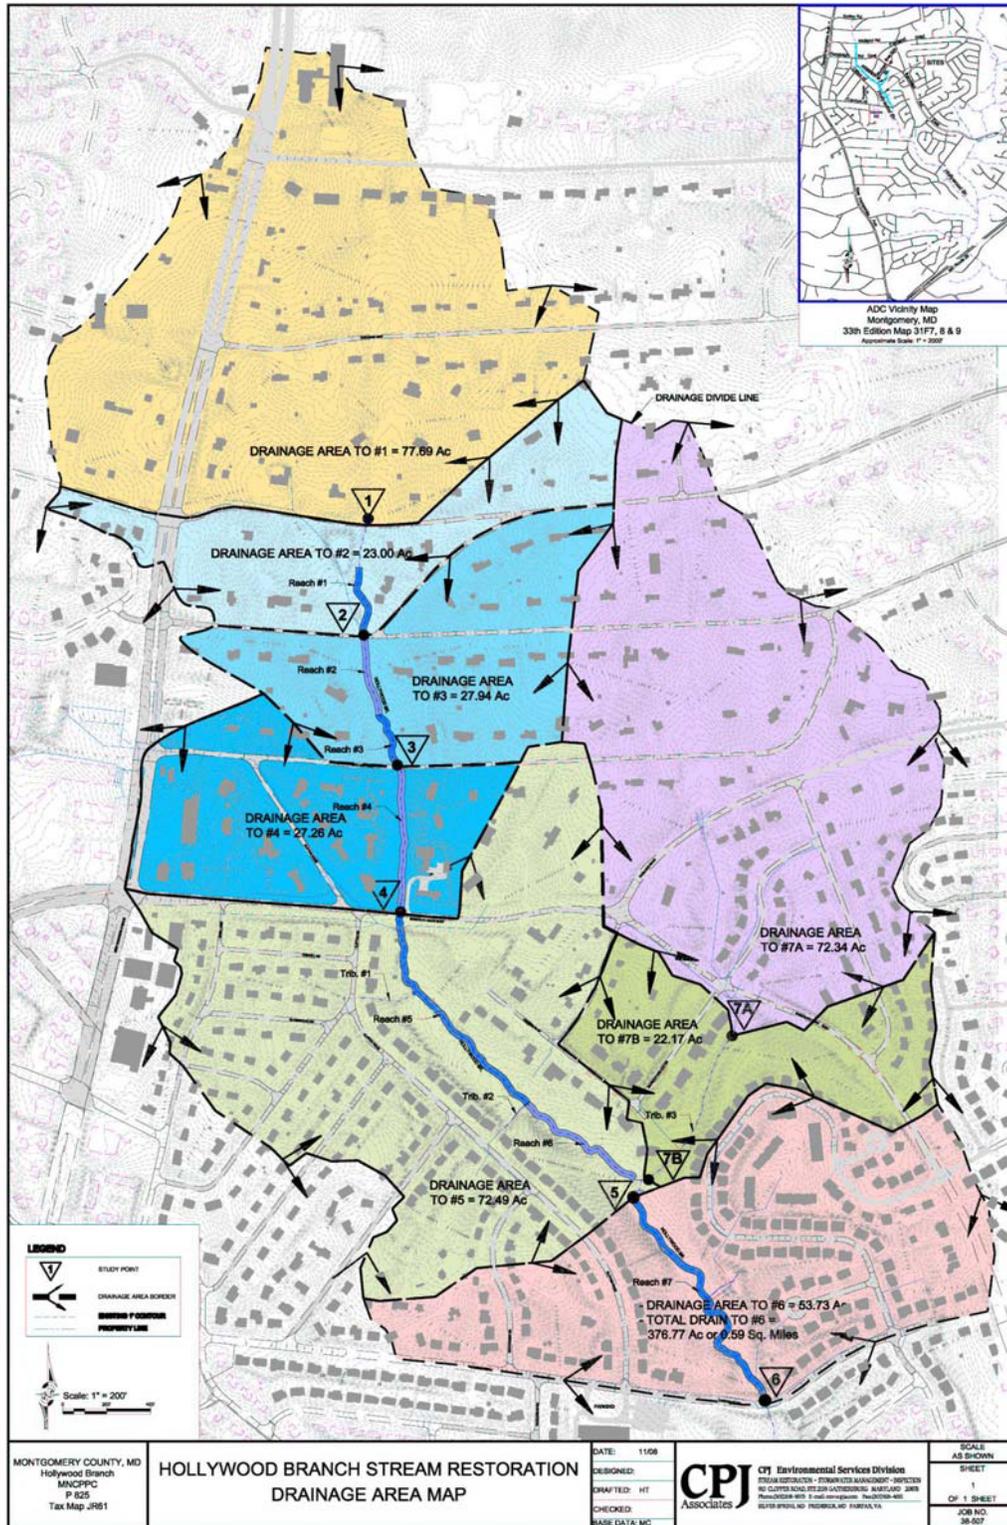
Hollywood Branch Stream Restoration Drainage Area
